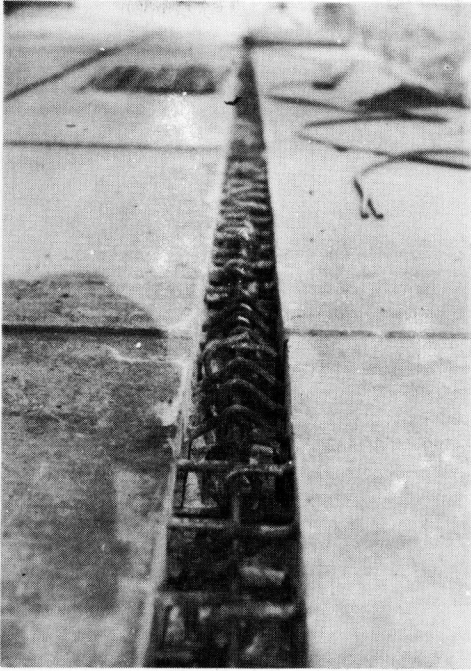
Baker River Bridge - Note interlocking steel in longitudinal joint.
